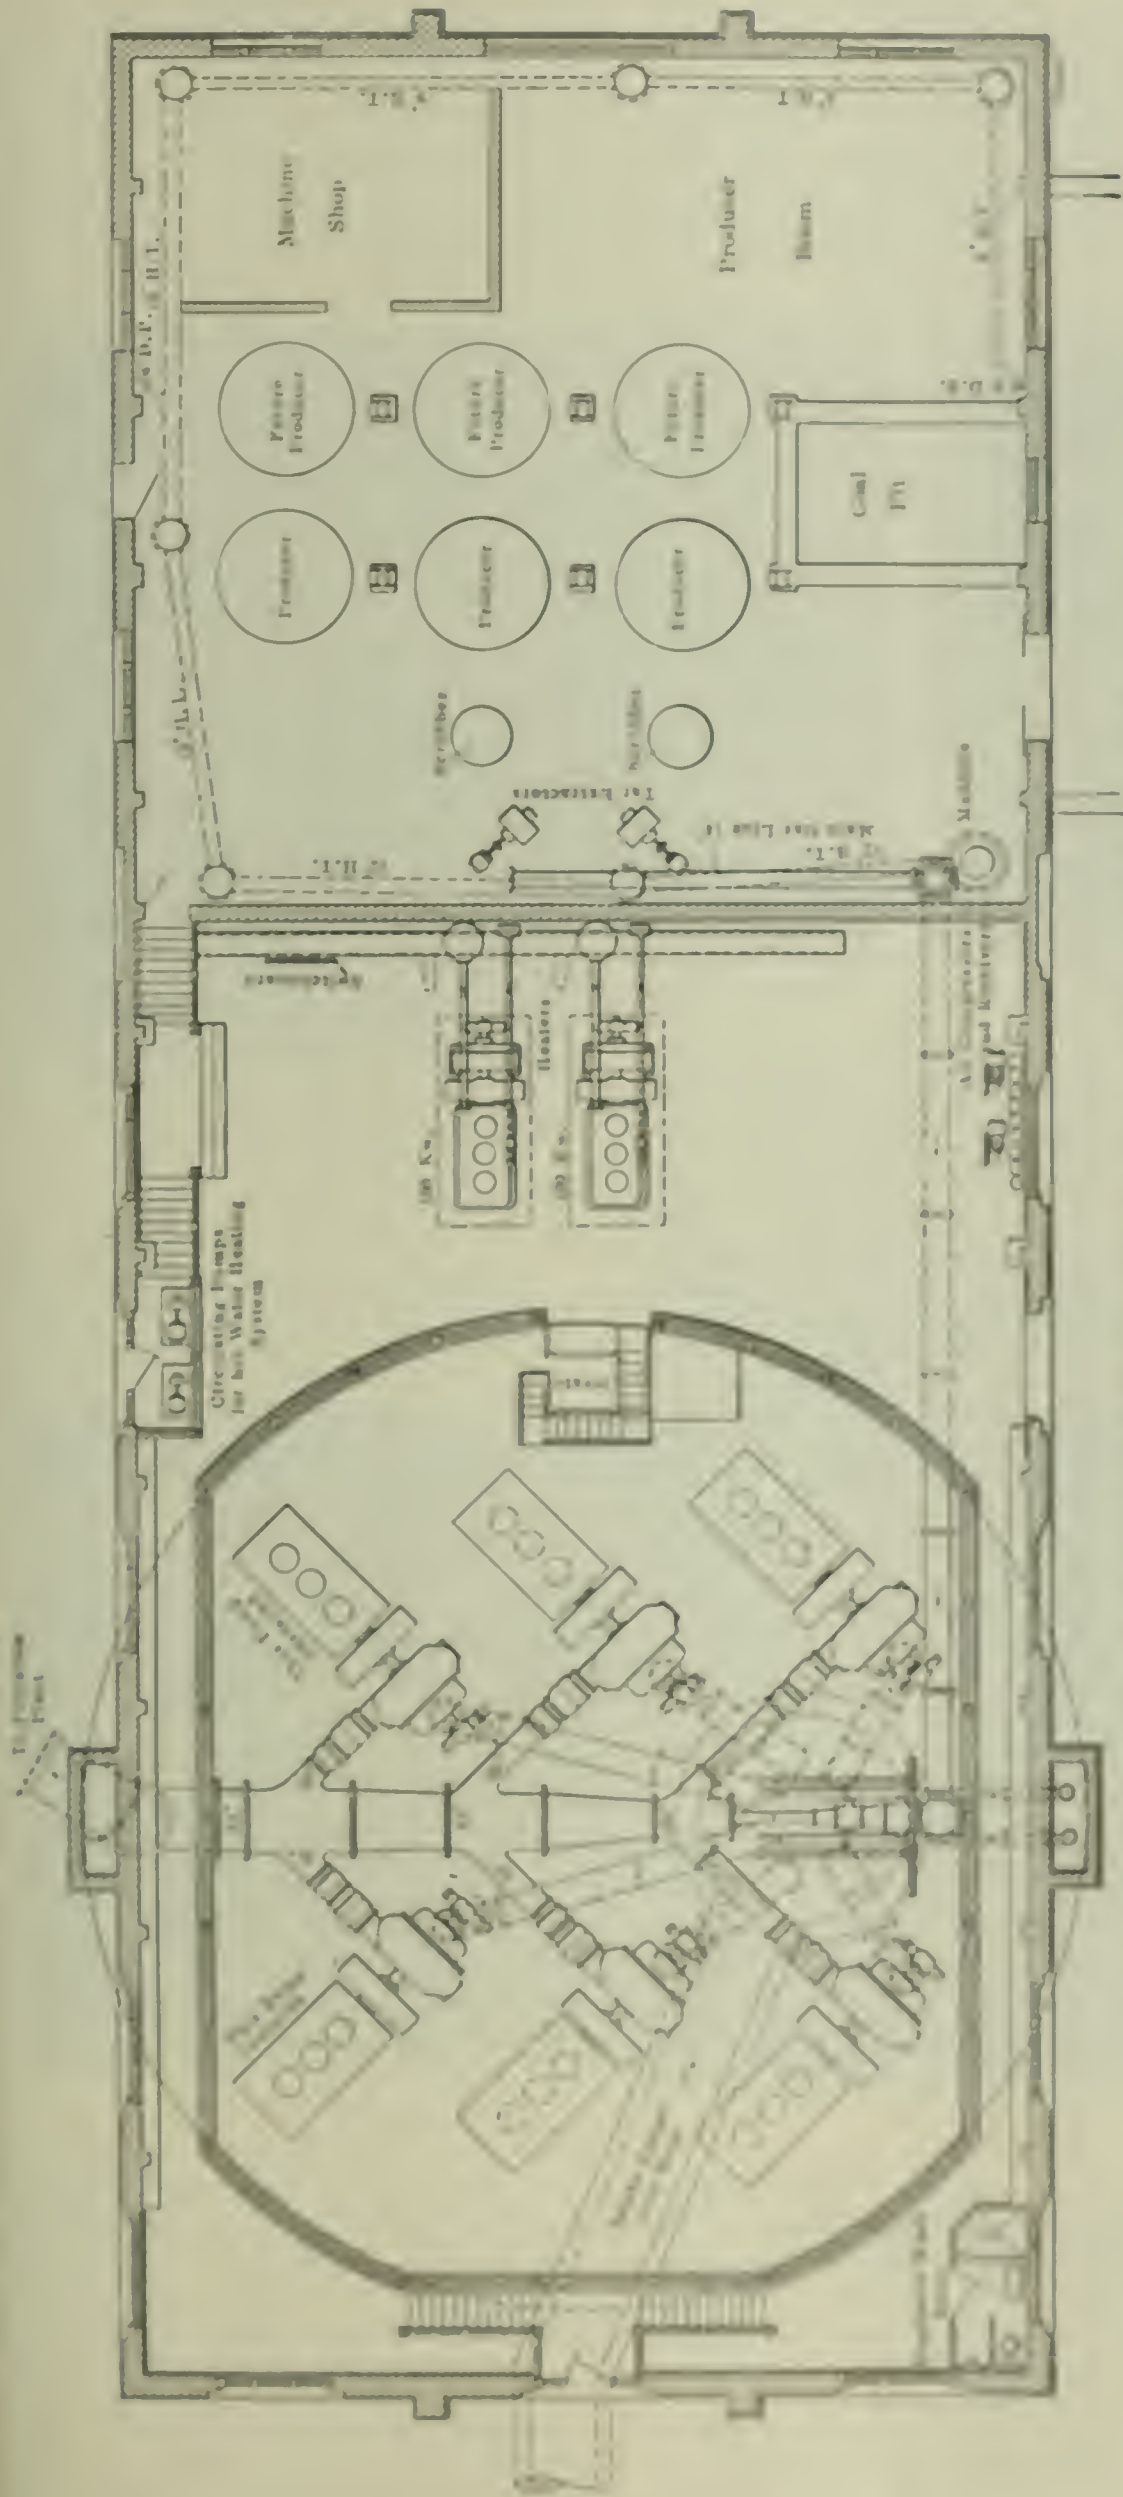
LAYOUT OF THE GAS-ROOM PUMPING PLANT OF THE TOLEDO WATERWORKS.
